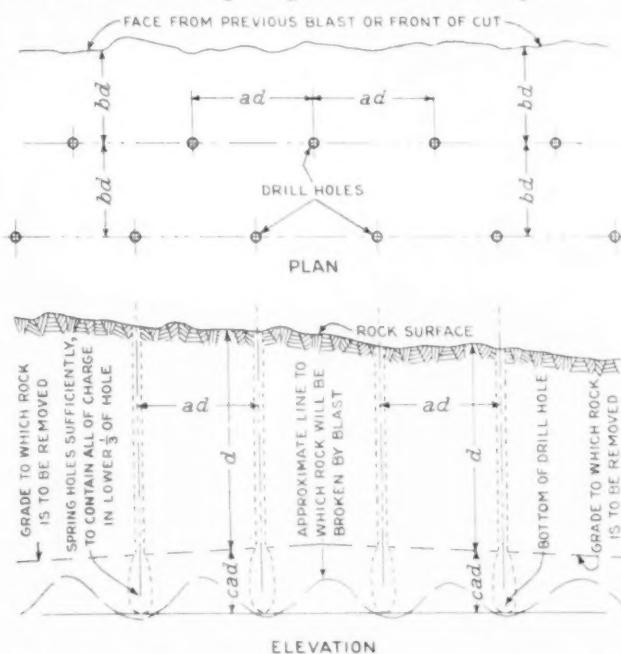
SUGGESTIONS FOR PLACING DRILL HOLES. DIAGRAM SHOWS PART PLAN AND PART ELEVATION OF NEARLY LEVEL THROUGH CUT
